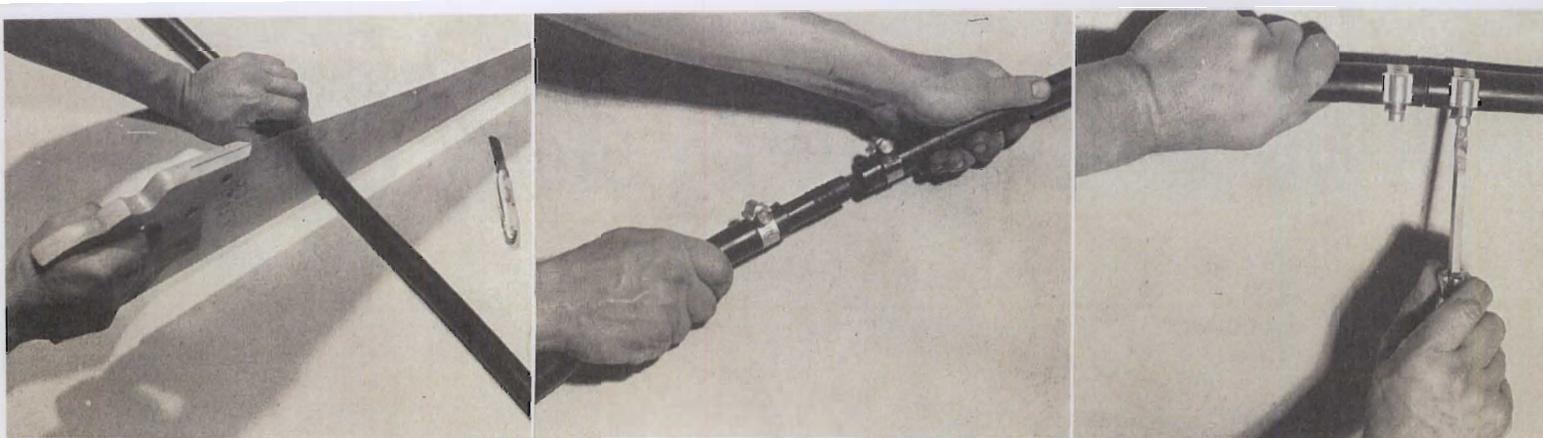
To couple plastic pipe, first cut pipe to proper length. Make connection with insert-type coupler and clamps. Tighten stainless steel clamps with screwdriver.
